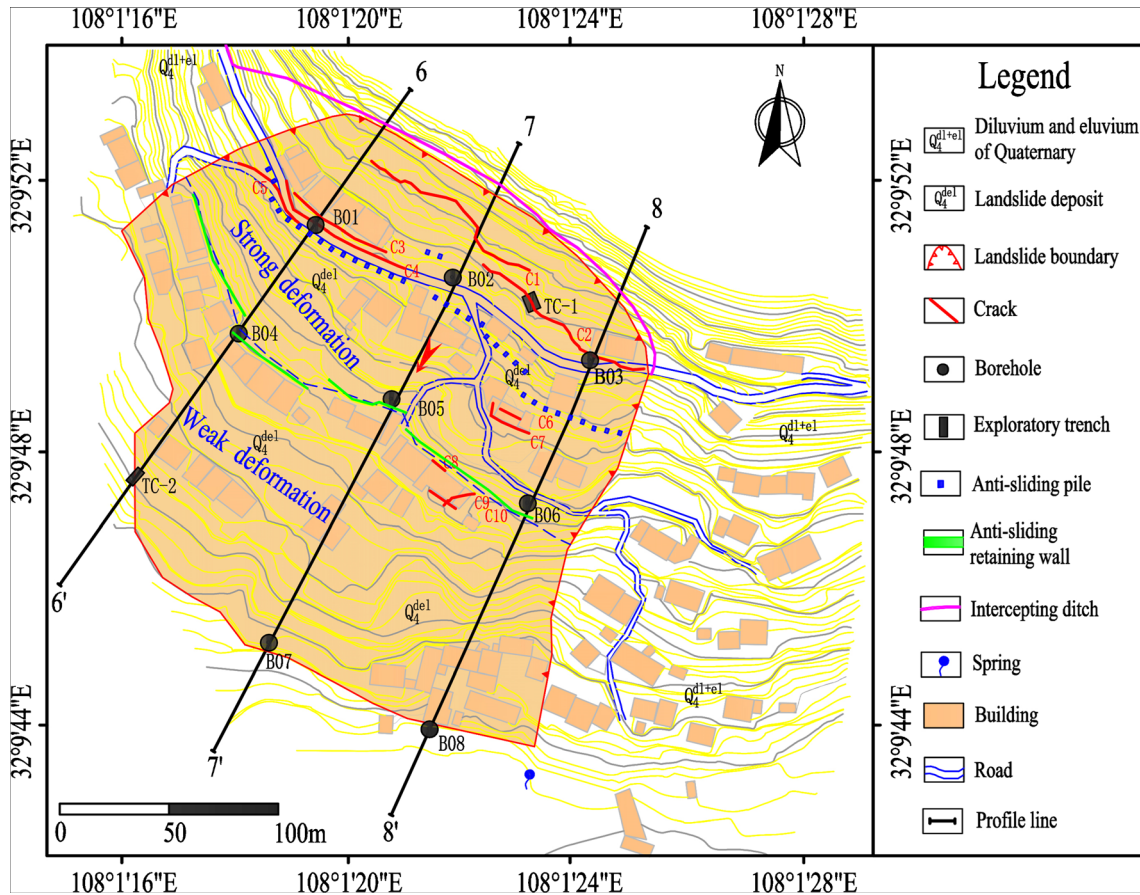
Plan view of proposed engineering control measures to prevent landsliding
